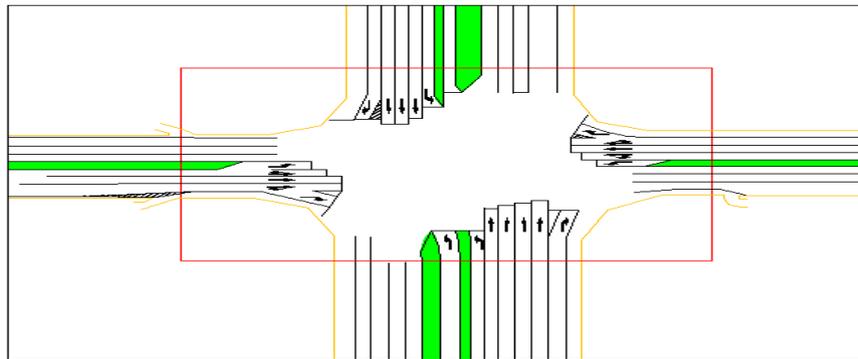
Chang'an Road - Xiaozhai Road intersection
